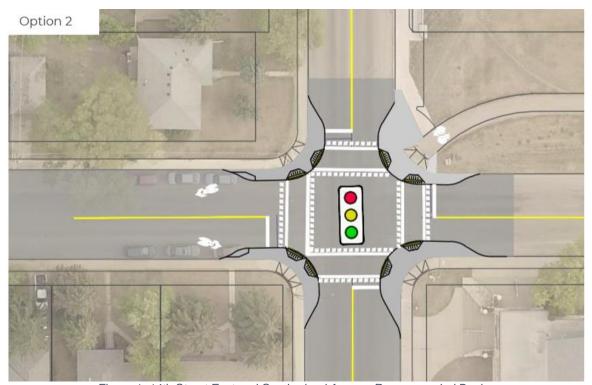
14th Street East and Cumberland Avenue Recommended Design
